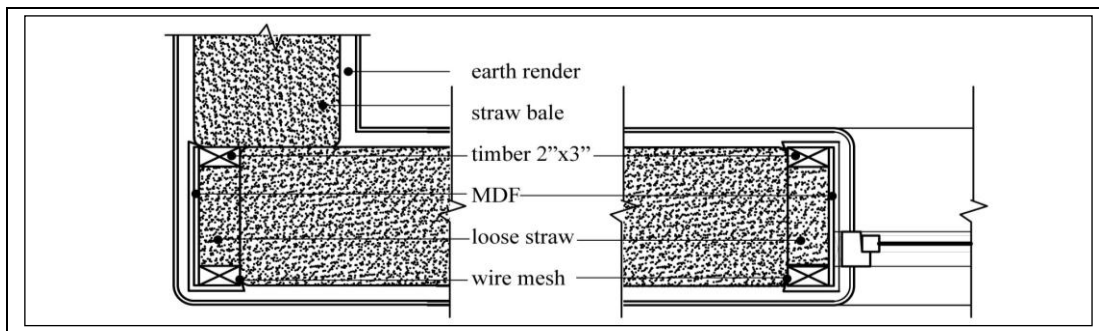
Plan of Prefabricated Elements at Corner and Window Detail
